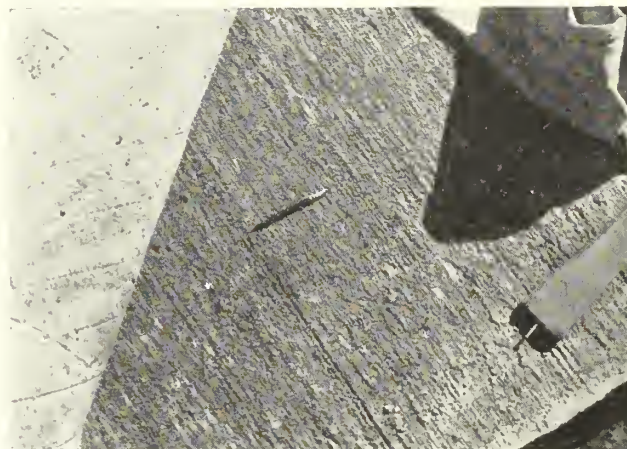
PORTION OF CONCRETE PAVEMENT SLAB AND COTTON MATS USED IN CURING IT.
